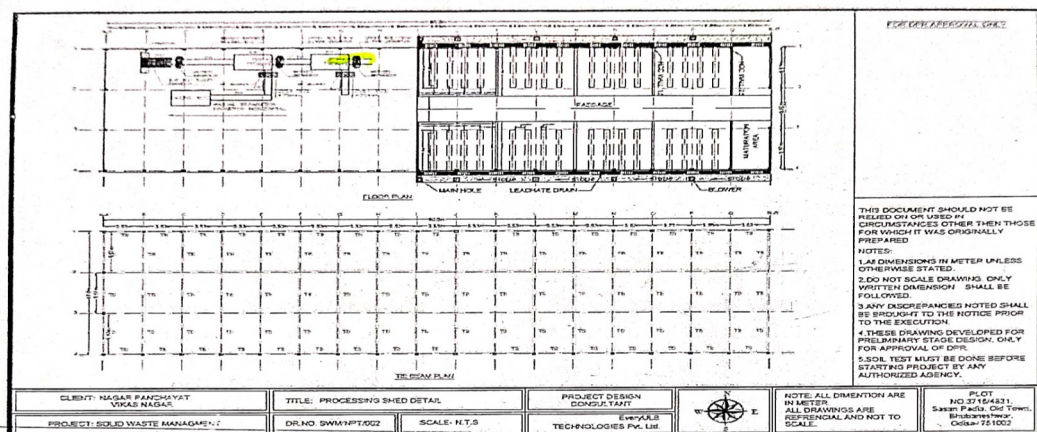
Schematic layout of the proposed processing cum disposal site of NPP Vikasnagar
